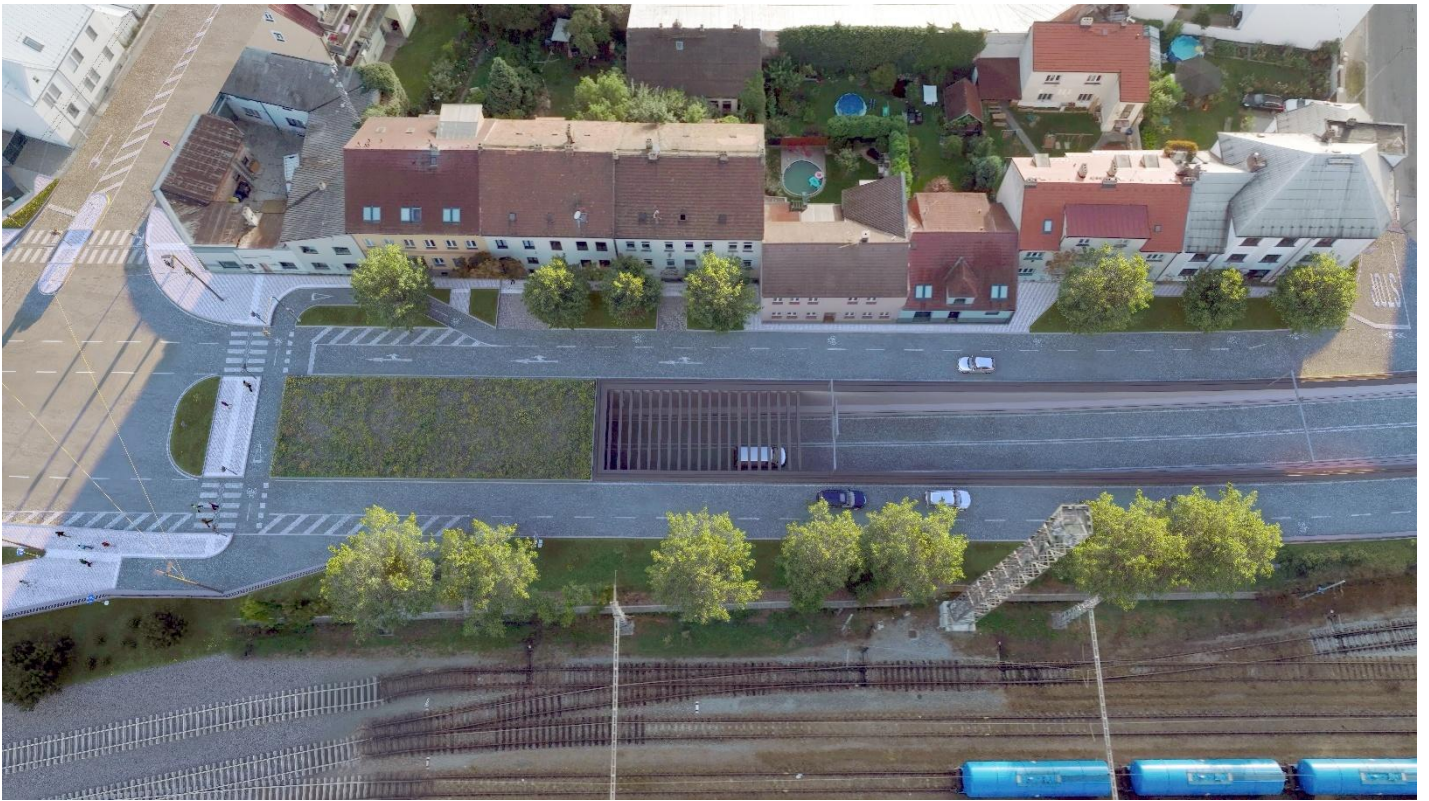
View of the U Lávky portal – upper bracing of the ramp with concrete beams
